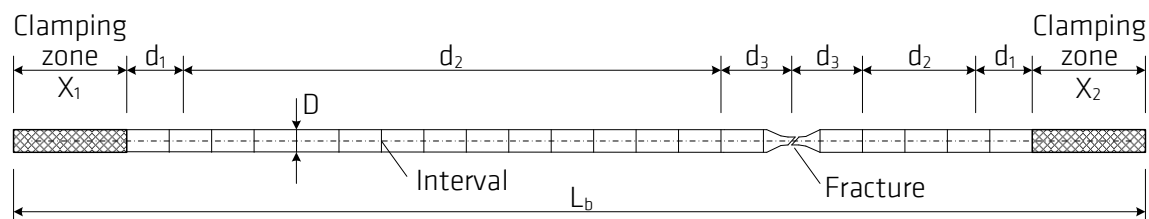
Geometry of reference bar after testing with definition of dimensions and distances
